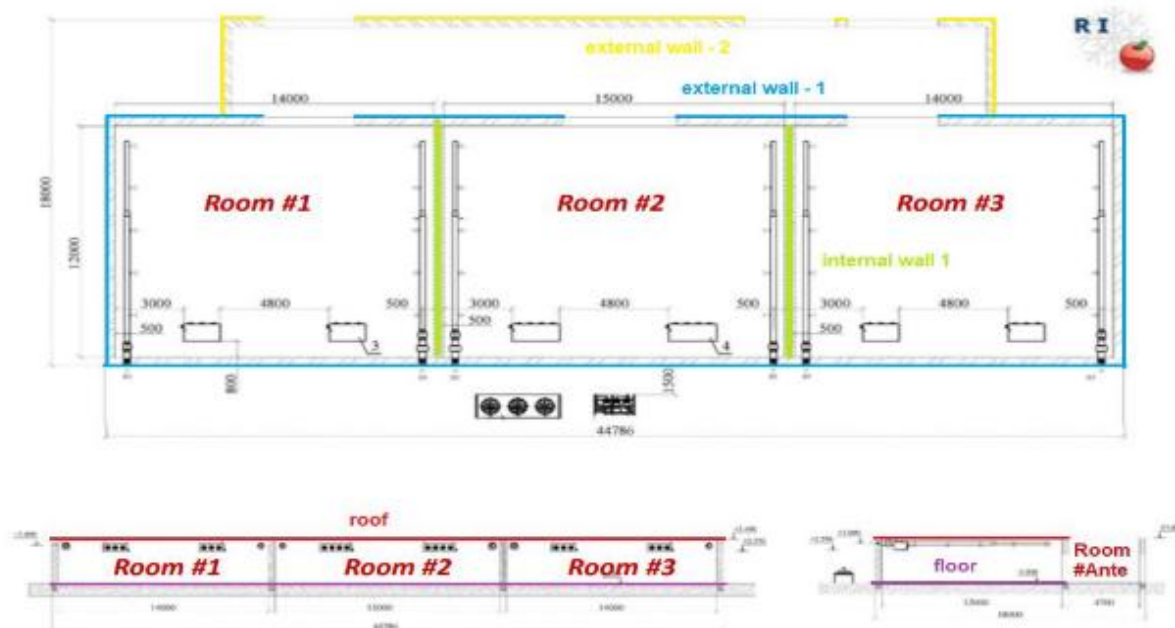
Dimensions of the refrigeration plant and classification of the type of the wall.
